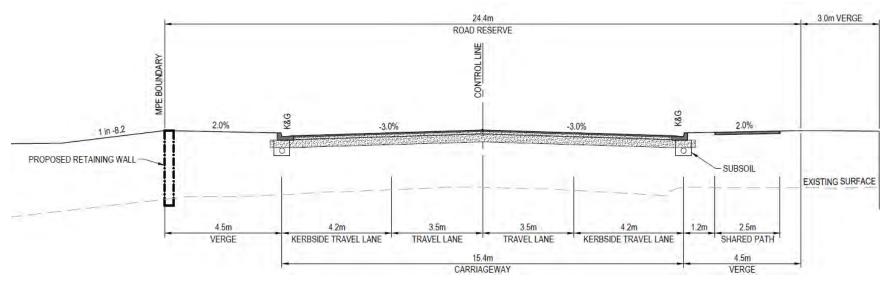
Indicative cross section – Moorebank Avenue 4 lane configuration
